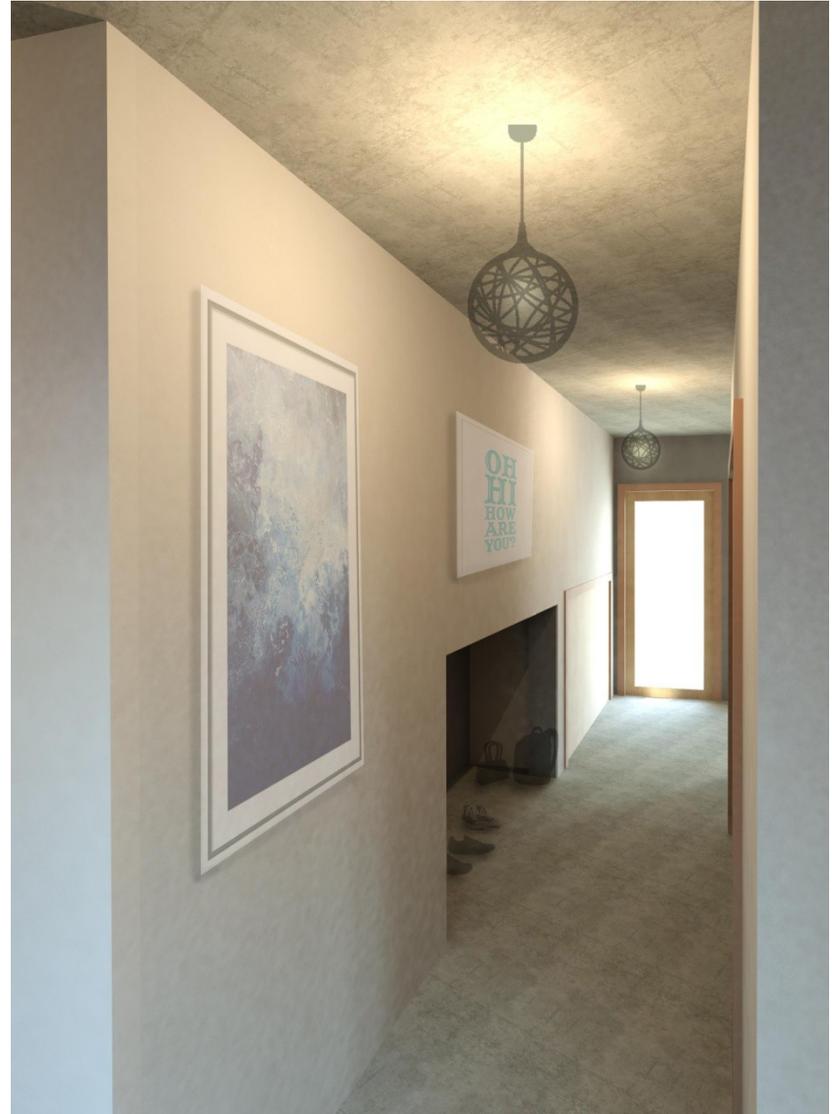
Ground Floor Three Bedroom Unit Entry Hall
